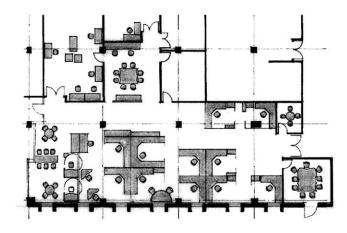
Floor plan of design proposal. This was constructed in the Laboratory for Remote Collaboration, a subgroup of the LX lab.
